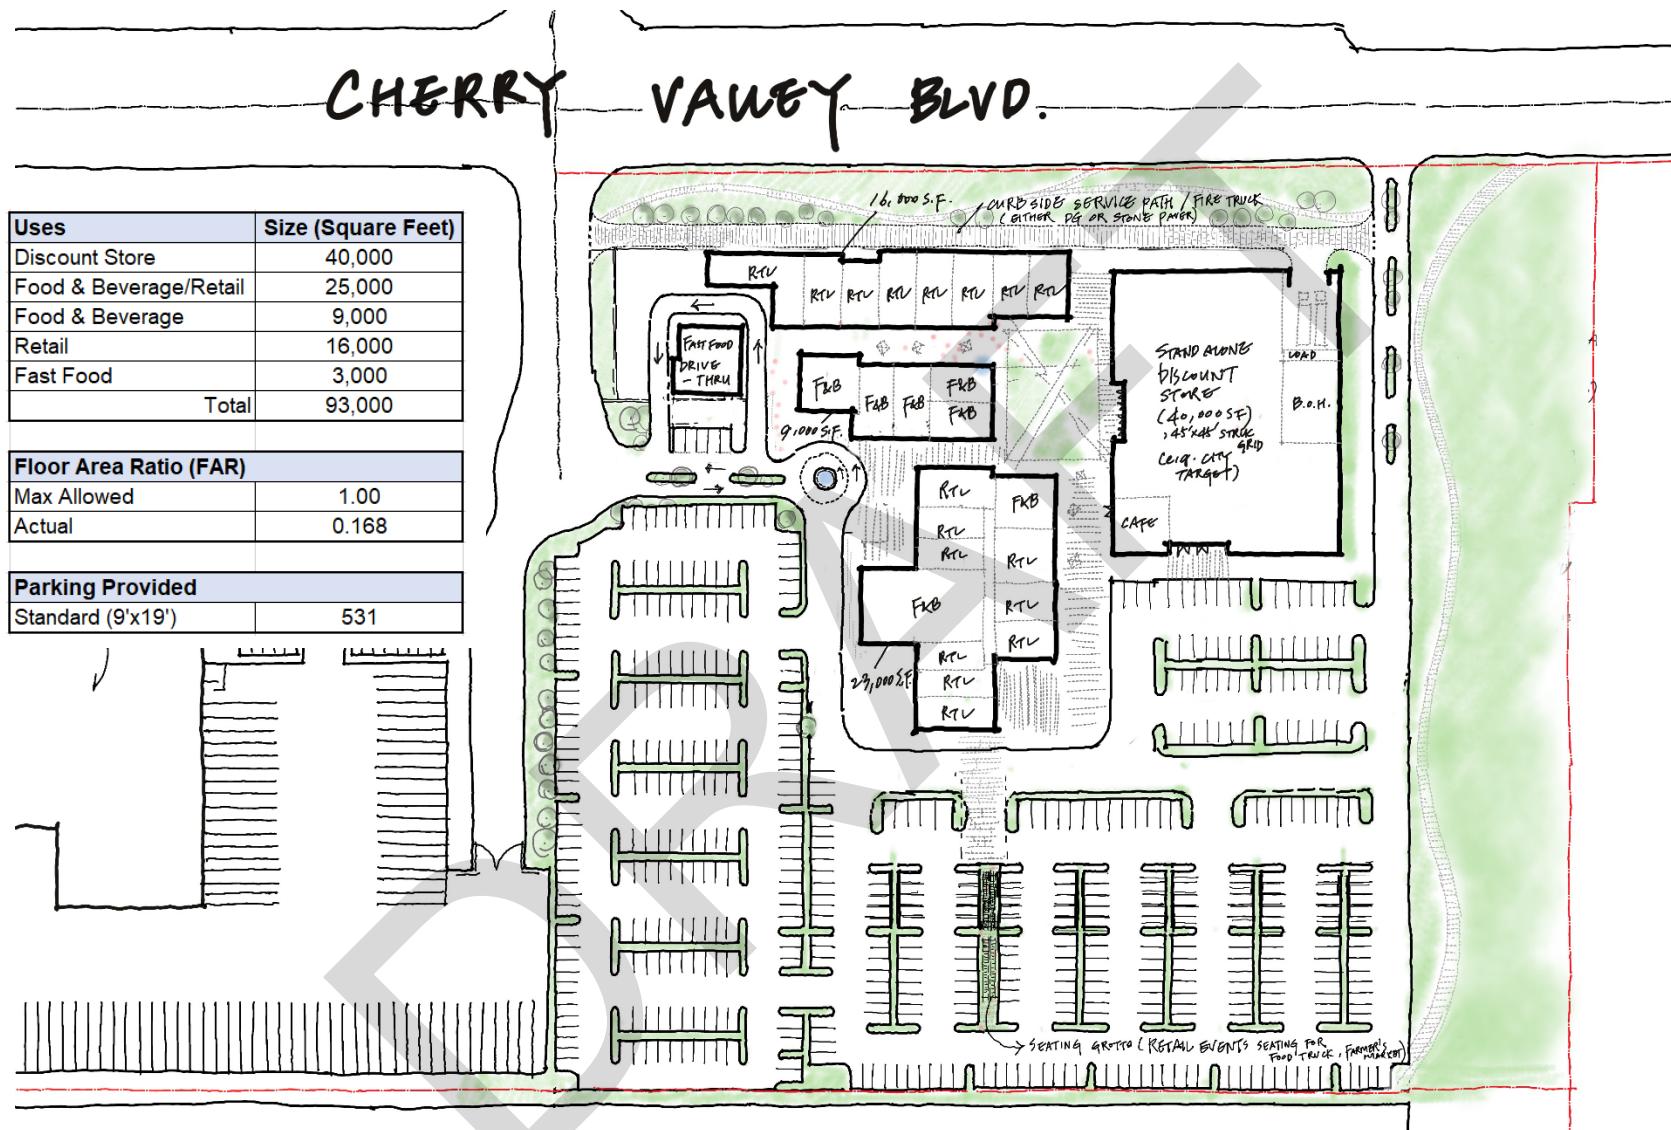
Commercial Planning Area Conceptual Site Plan - Scenario Option #2
